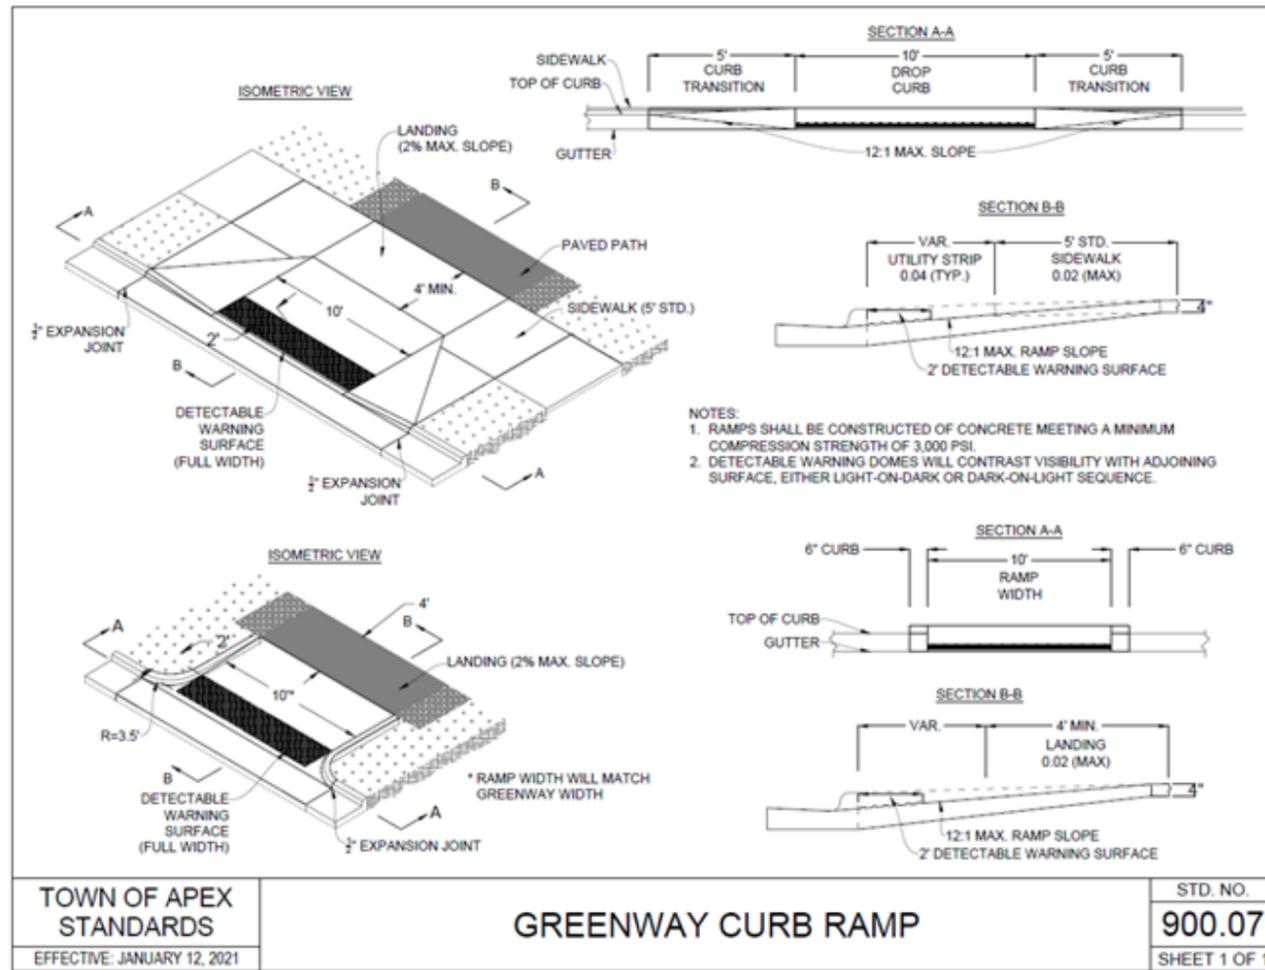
Existing Design Standard for Existing Design Standard for Greenway Curb Ramps / *Town of Apex
